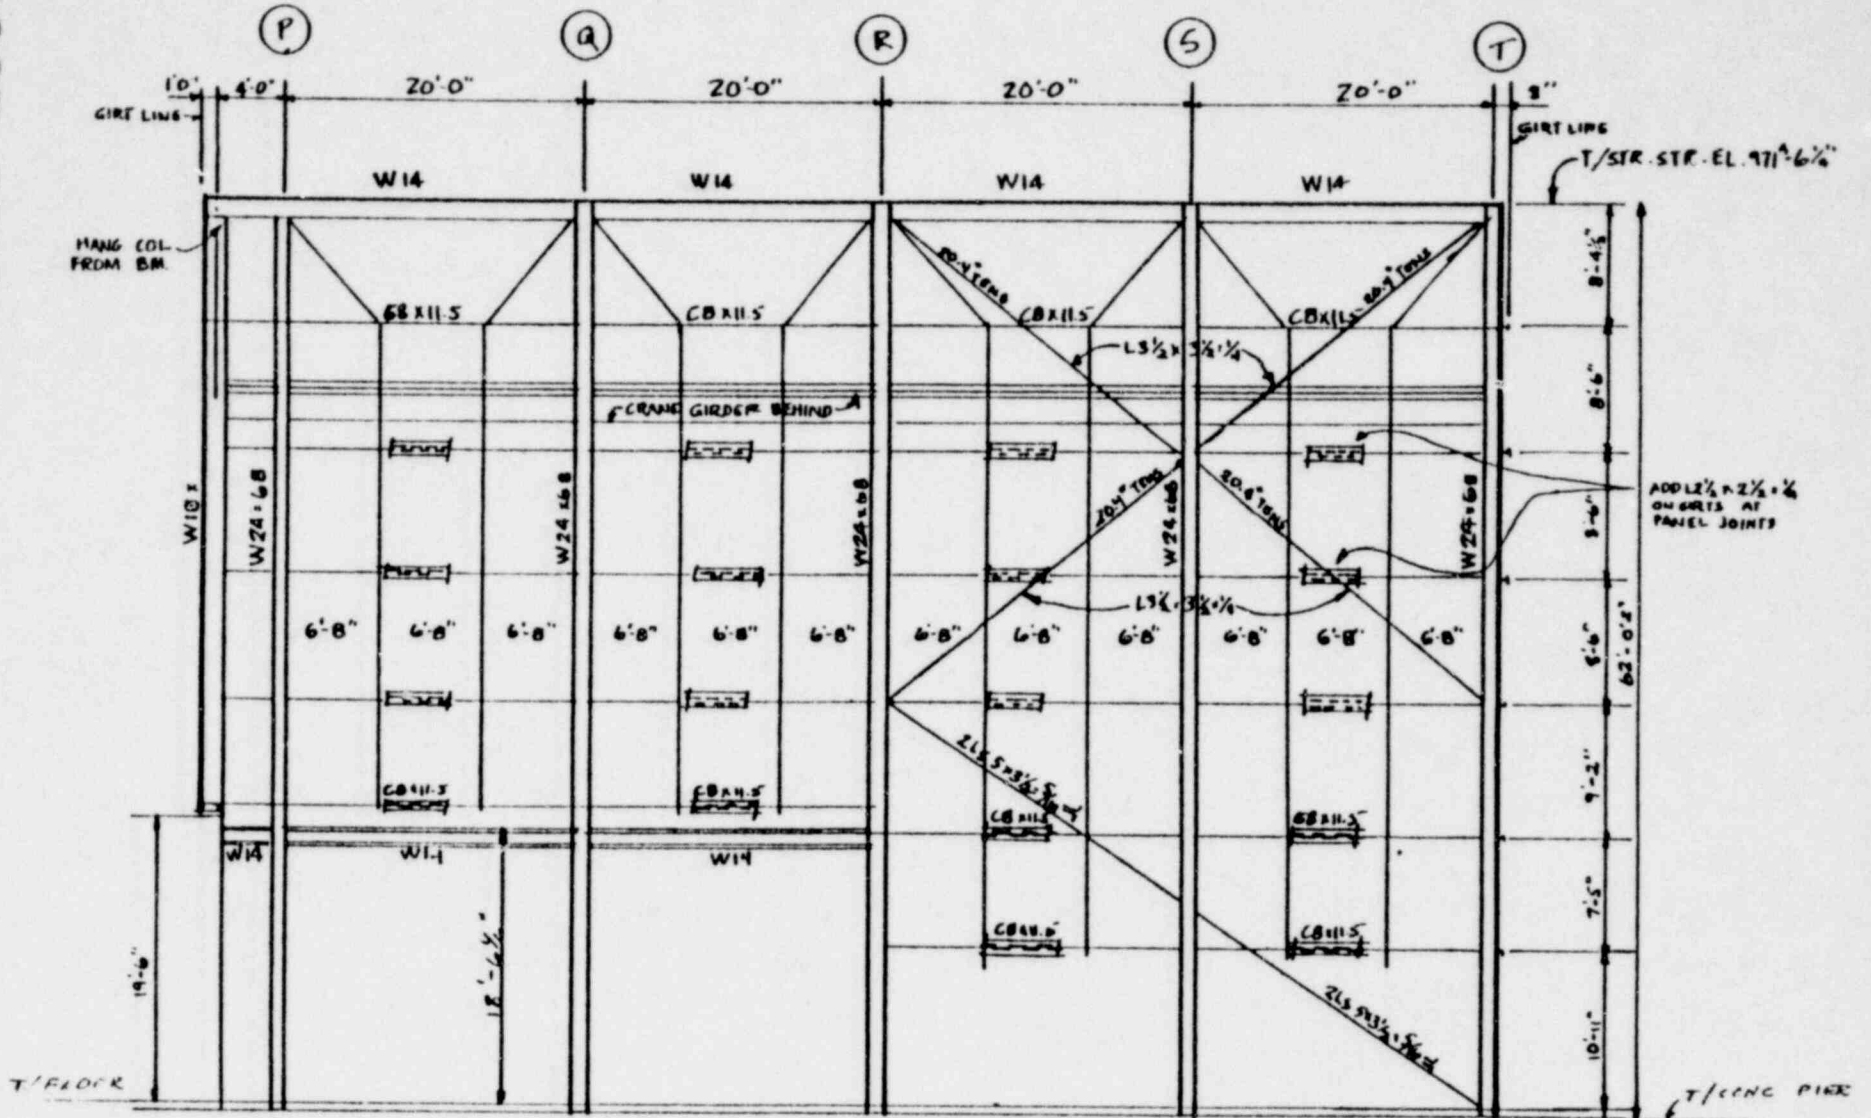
JN-1B NORTH WALL FRAMING ELEVATION
